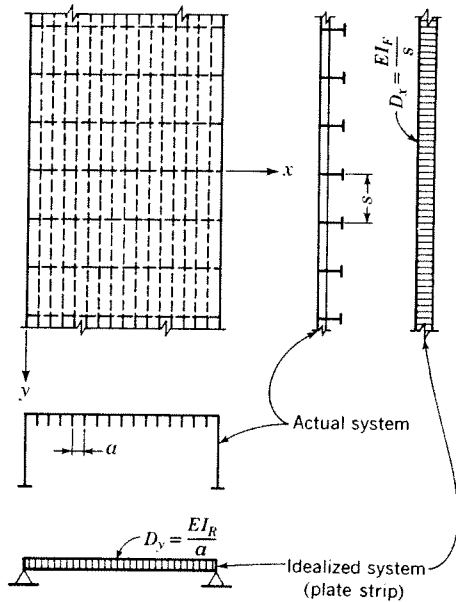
Bridge deck treated as an orthotropic plate strip
